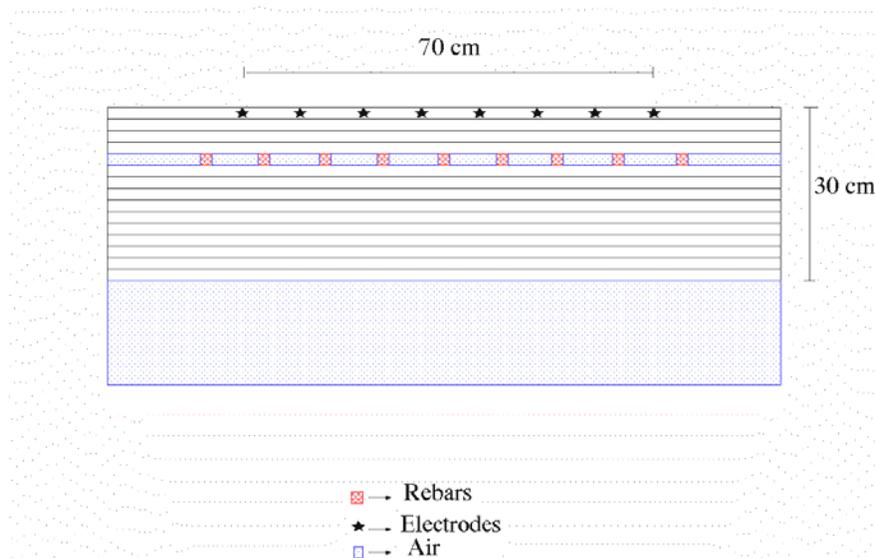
concrete slab model used for the numerical modeling showing the location of electrodes and rebars
